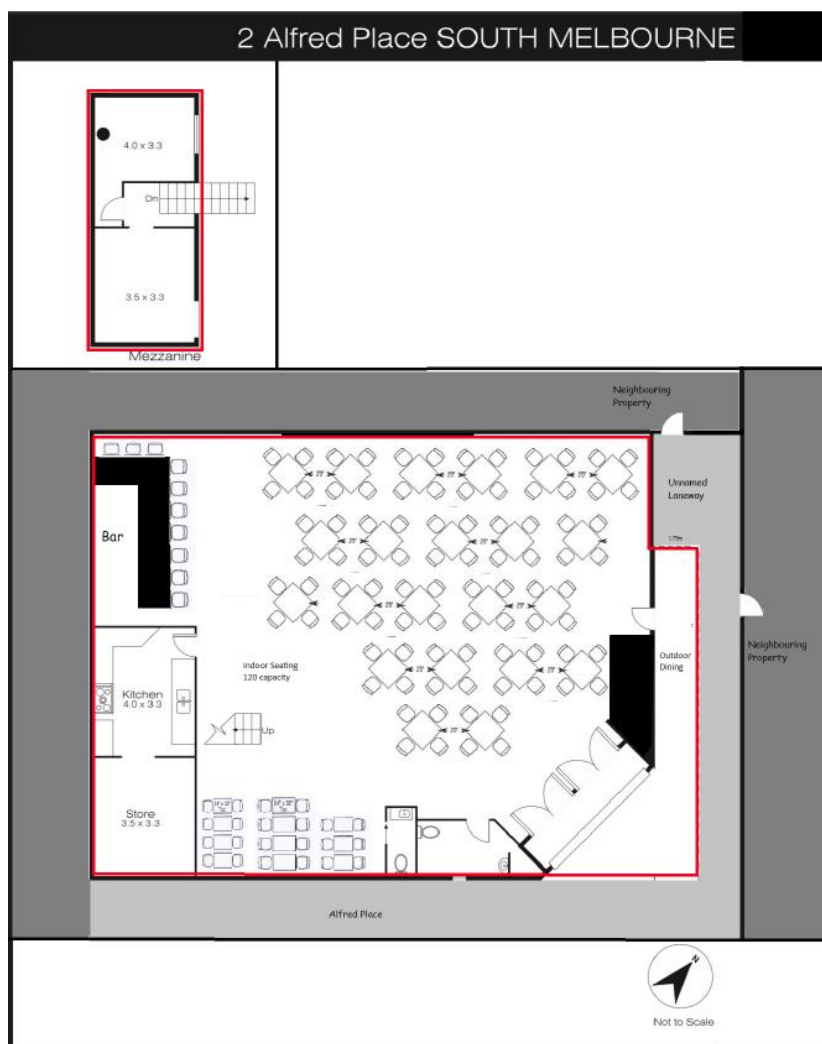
site plan with proposed redline plan which includes the outdoor dining area.
